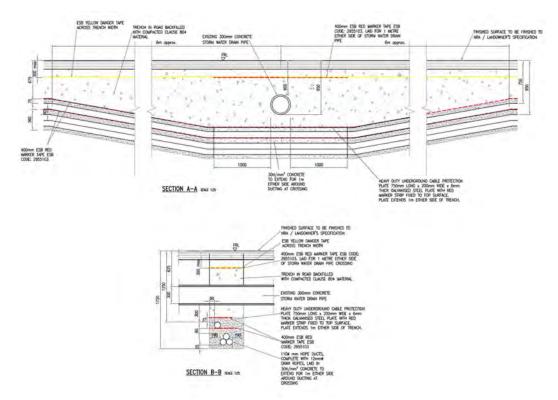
Typical Piped Culvert Crossings - Ducting under culvert crossing details.
